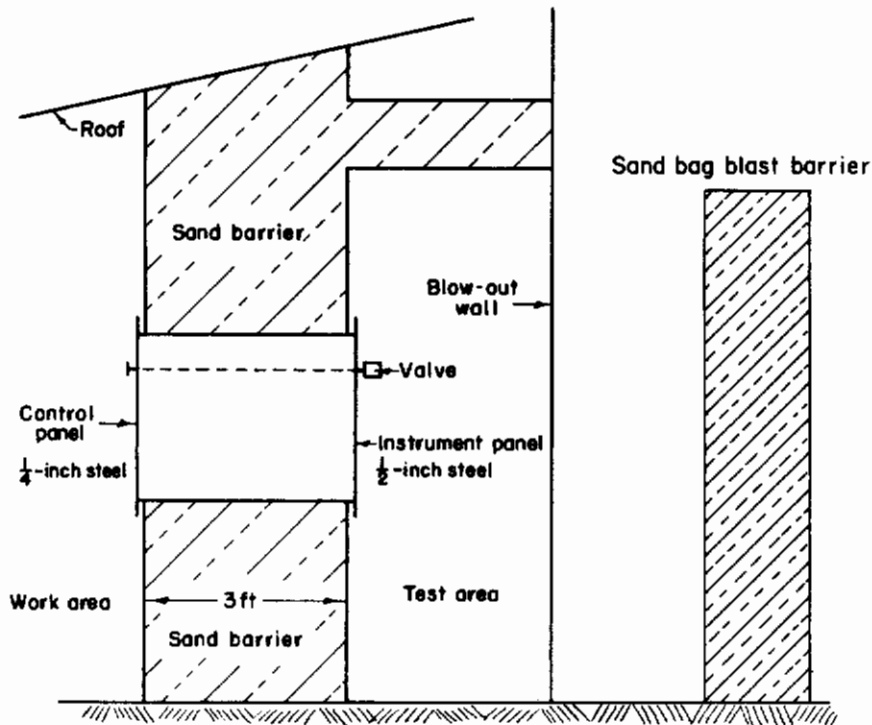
ELEVATION OF LABORATORY CELL SHOWING THE SAND BARRIERS
